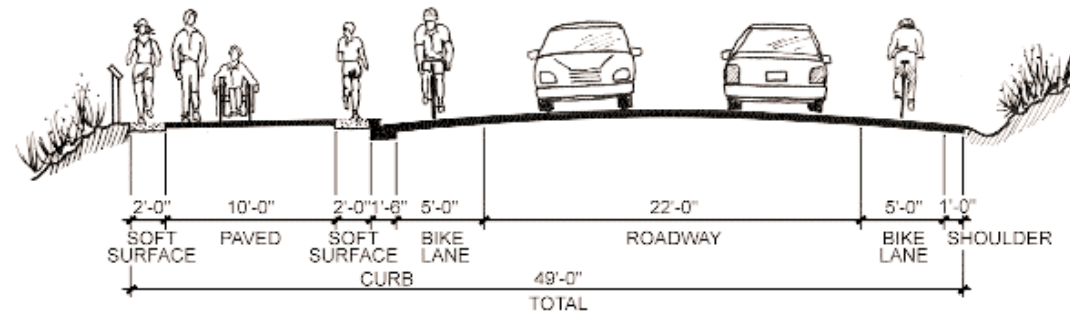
Proposed Development at Lincoln Boulevard at Pershing Drive North
